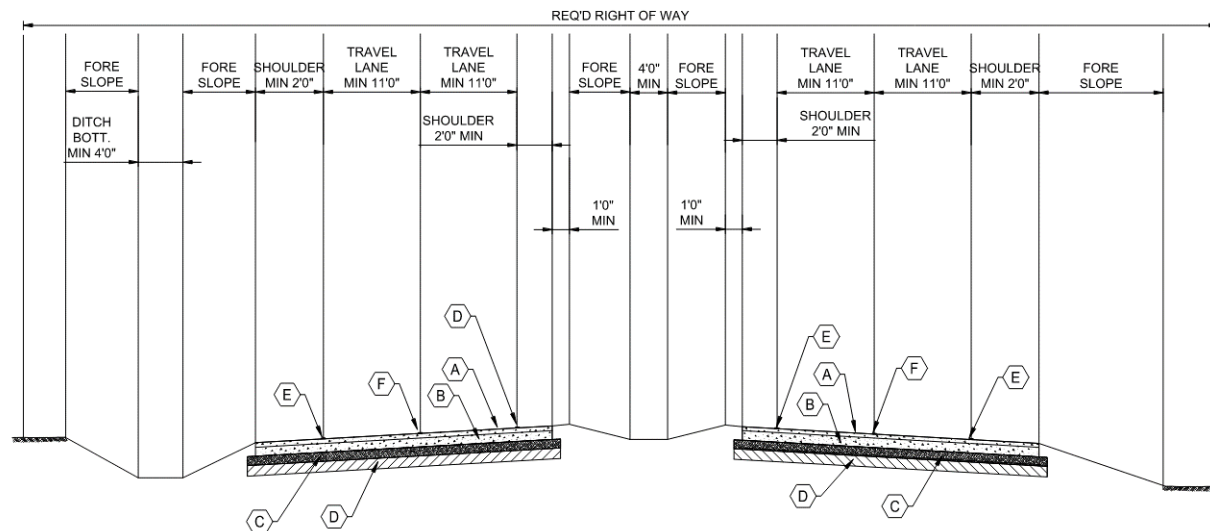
Cross-Section Elements and Requirements for Uncurbed Roadway, 4 Lanes, Portland Cement Concrete Pavement
